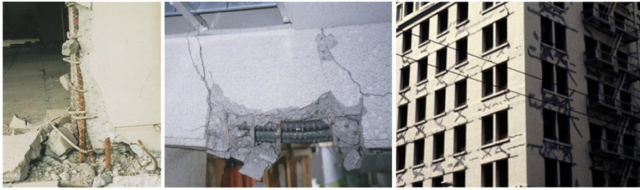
Bond failure in reinforced members (left, center) and shear failure in coupling beams (right)
